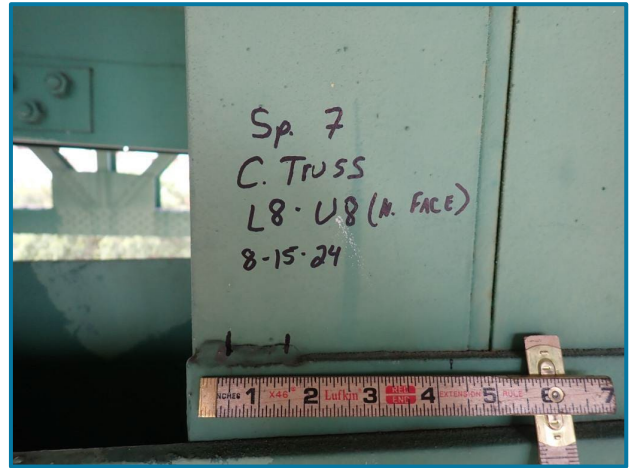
1” crack in the fill plate weld to the vertical (U8L8 of the Center Truss, Span 7).
